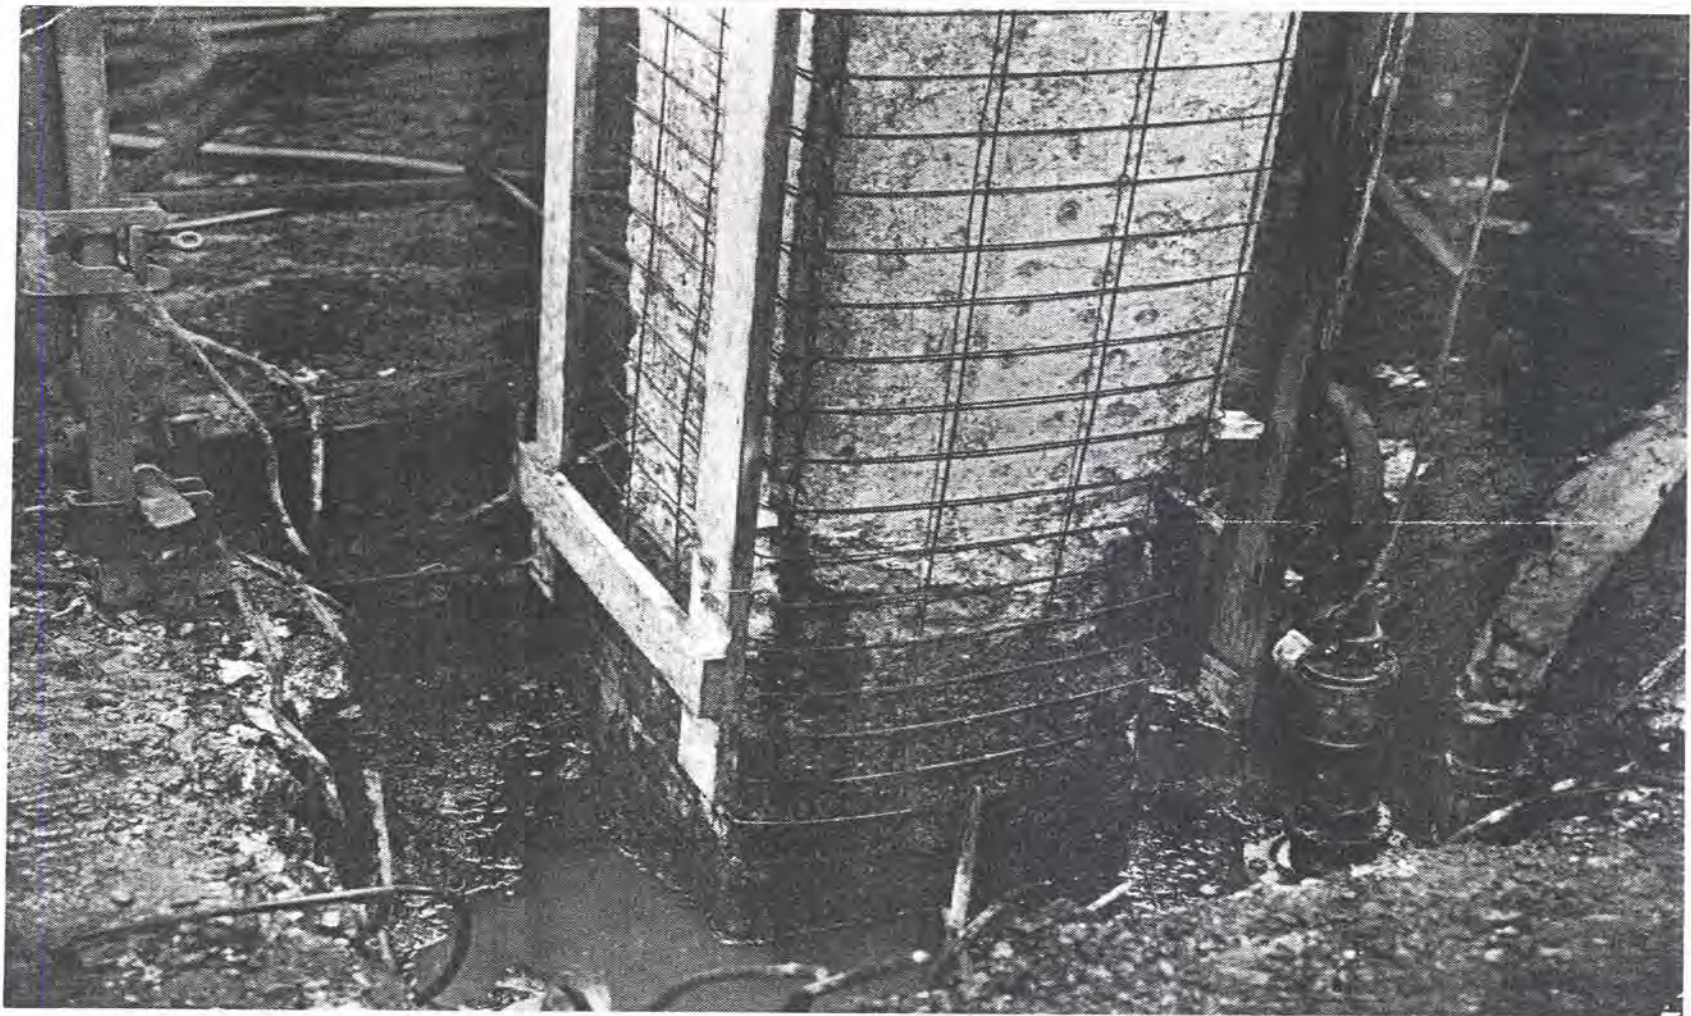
Concrete column with reinforcement and timber formers fixed for sprayed concrete repair
